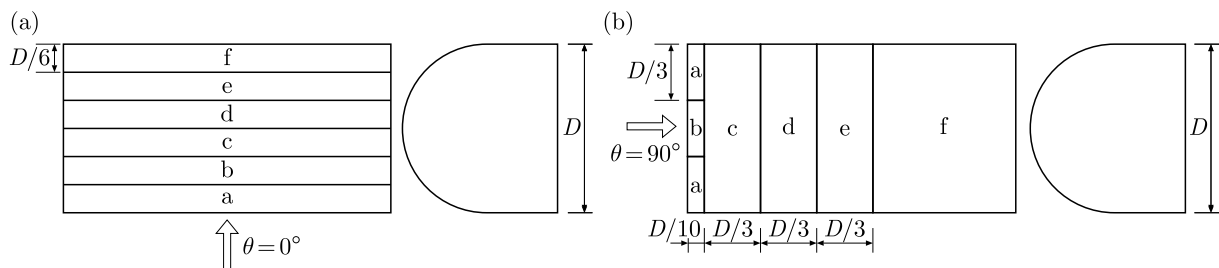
Roof zoning of BRE wind tunnel test: (a) 0° wind direction; (b) 90° wind direction.
